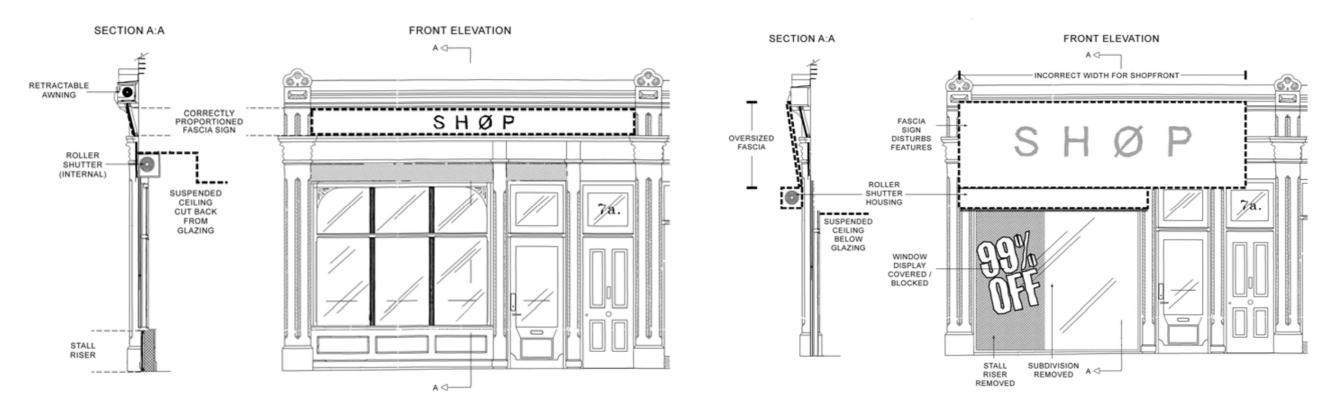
Camden Planning Guidance - Shopfront Standard
